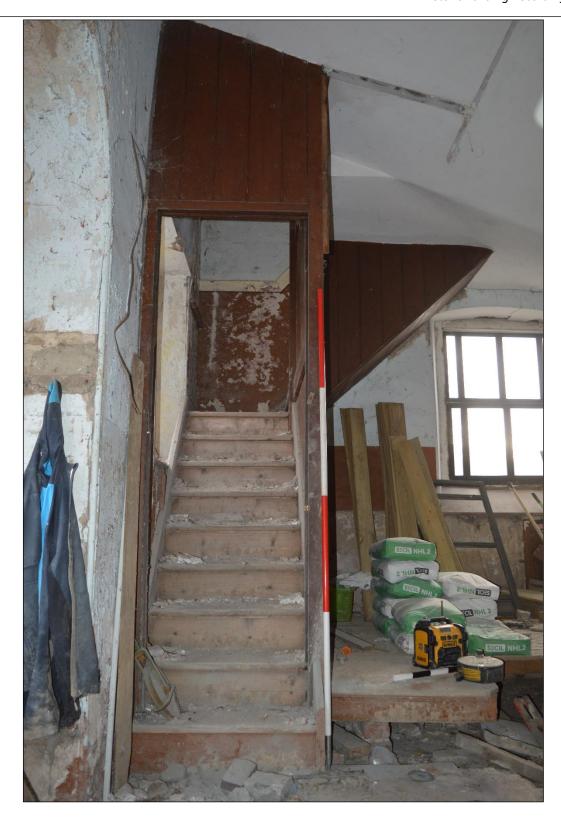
Stairs to balcony from ground floor. Photo CPAT 2745\_018
